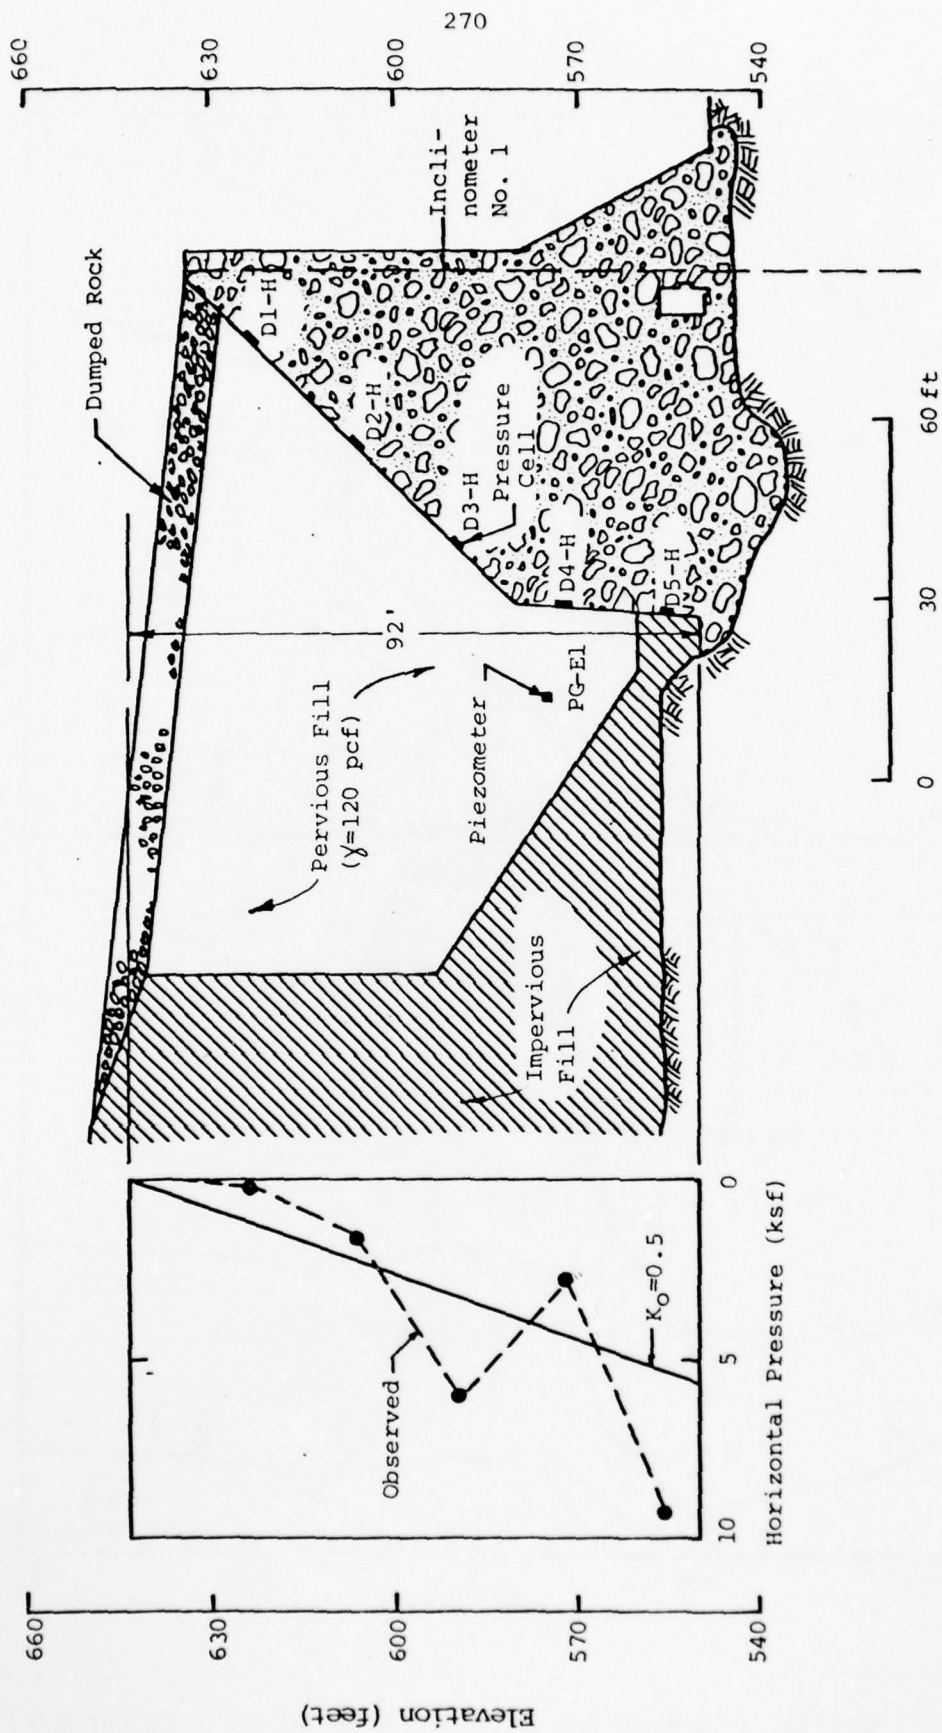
TOTAL EARTH PRESSURES AT END OF CONSTRUCTION, BLOCK D, WEST POINT DAM
